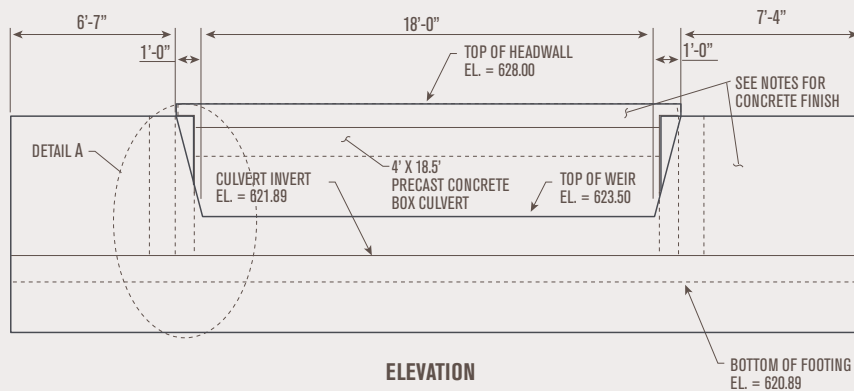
ELEVATION VIEW OF "CIPOLLETTI" TYPE DIVERSION WEIR.
